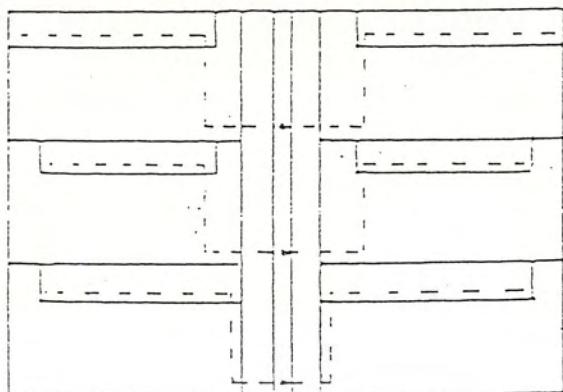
HORIZONTAL SUB MAIN IN FLOOR DUCT AT EACH FLOOR LEVER FROM A.
